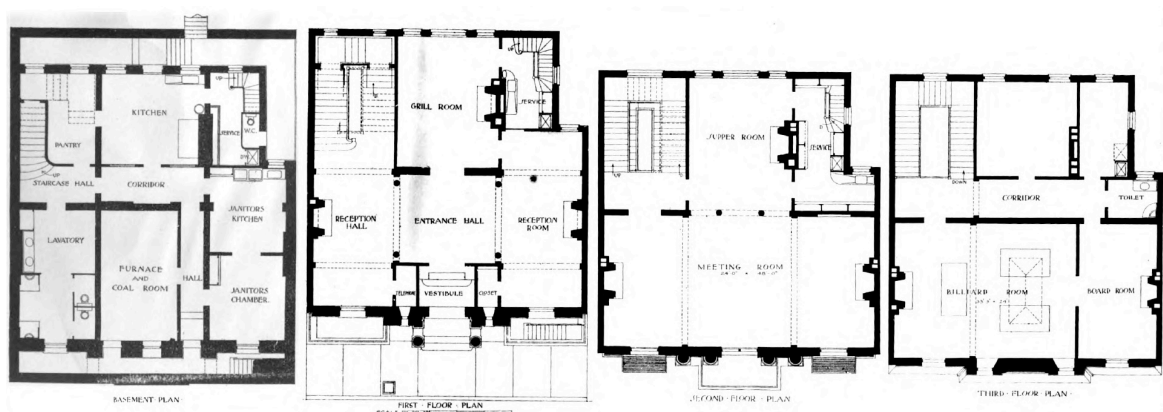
Floor plans, New York's Harvard House, by McKim, Mead & White. (*The American Architect and Building News*, 4/1021, 1895)
